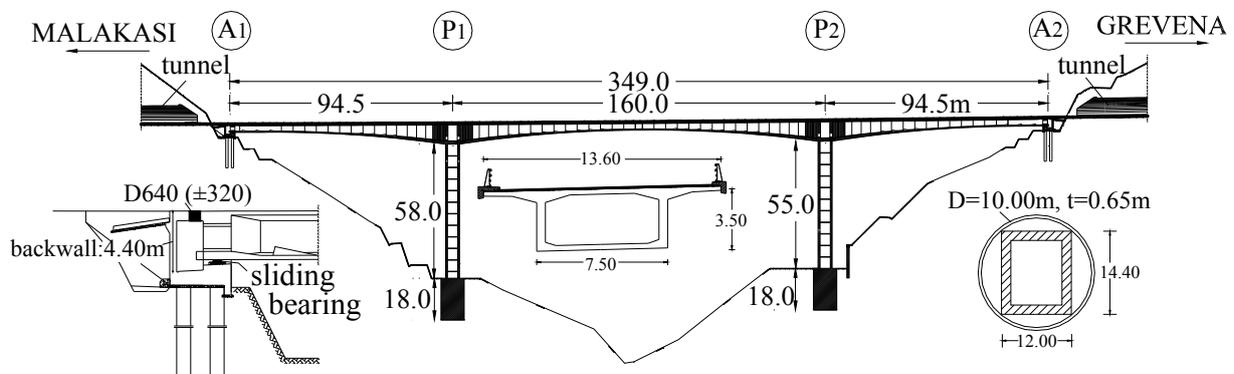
Longitudinal section of Malakasi-Grevena bridge and the cross sections of the abutment, the deck at the mid-span and the pier.
